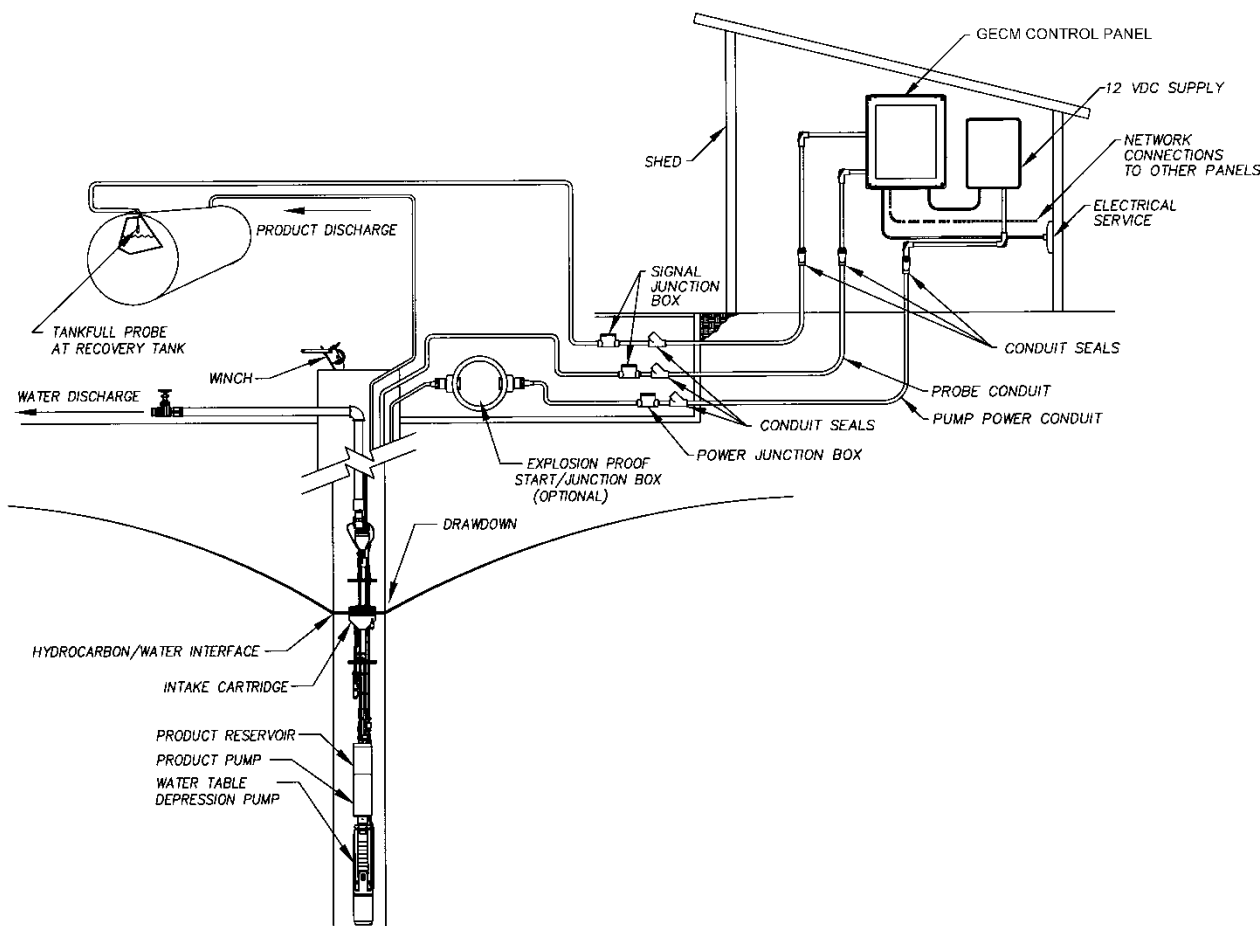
A WTDP ready SDFS deployed with the optional GECM, power supply, Tankfull probe, and explosion proof accessories
